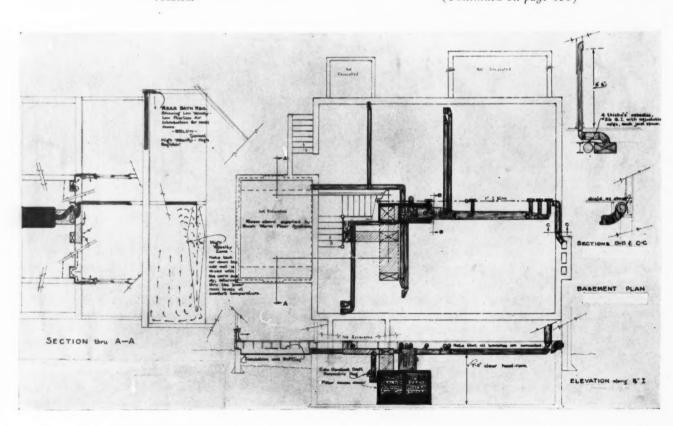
Plan of floor plenum heating, showing flow of air from furnace into each joist space. The air travels through the joist space to the outside wall where the air is admitted to the room through either a continuous baseboard grill, several baseboard grilles, or through registers under the windows. Plan is for another Buck installation and is, we believe, self-explanatory of the floor plenum method advocated.
